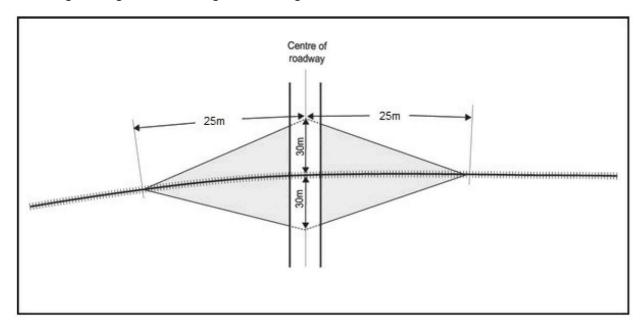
Approach sight triangles for public road/rail siding level crossings.
